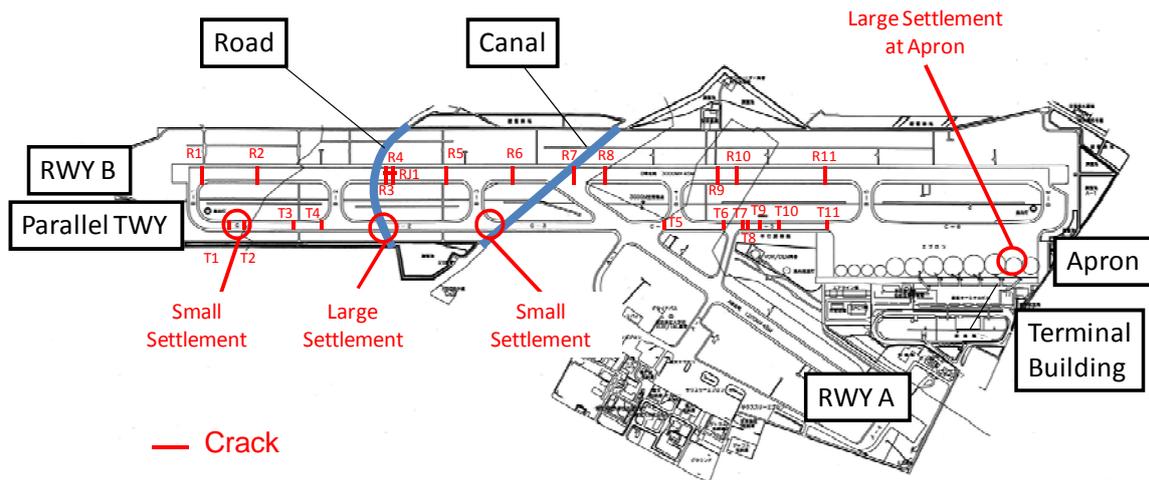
Status of Damage to Pavement
